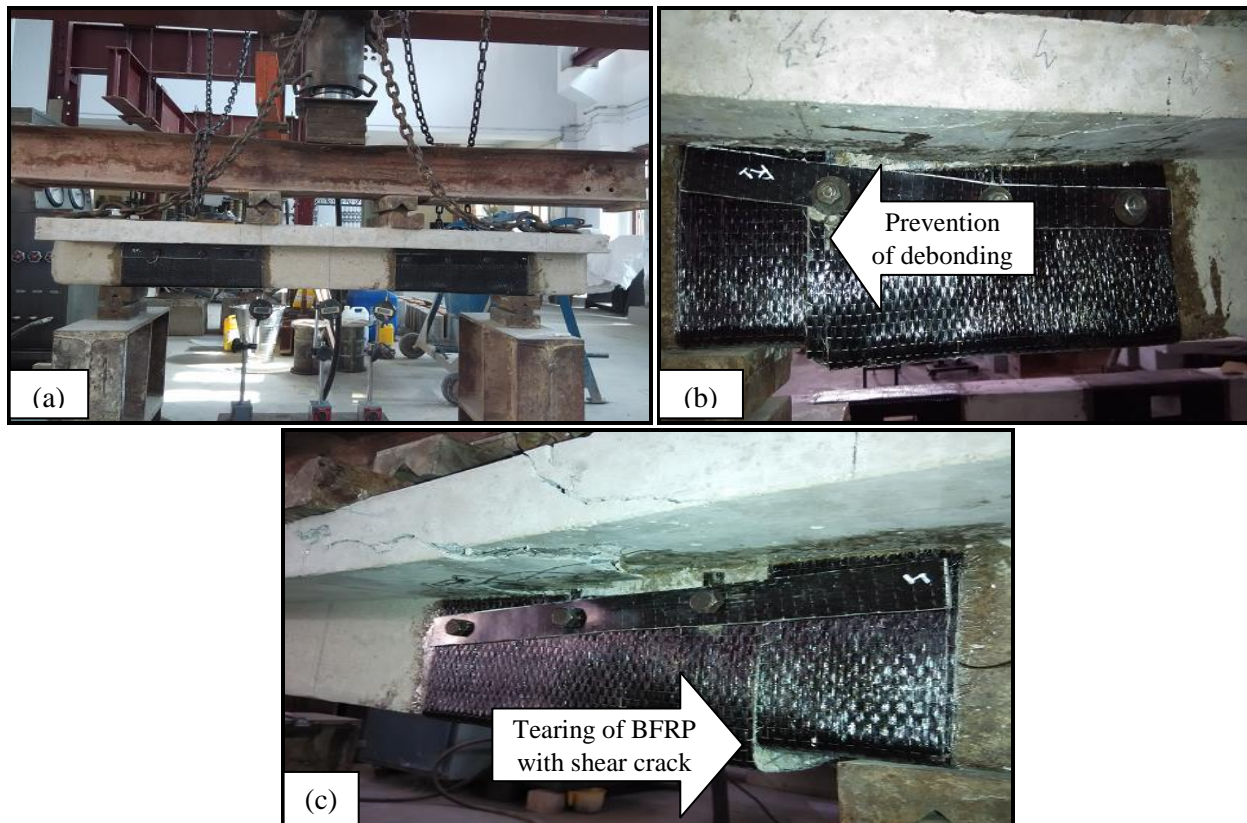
(a) Experimental Setup of beam SB11 under four-point loading system, (b) Prevention of debonding of BFRP sheet due to Anchoring System, (c) Ultimate failure of beam SB11 by tearing of BFRP sheet followed by diagonal shear crack
